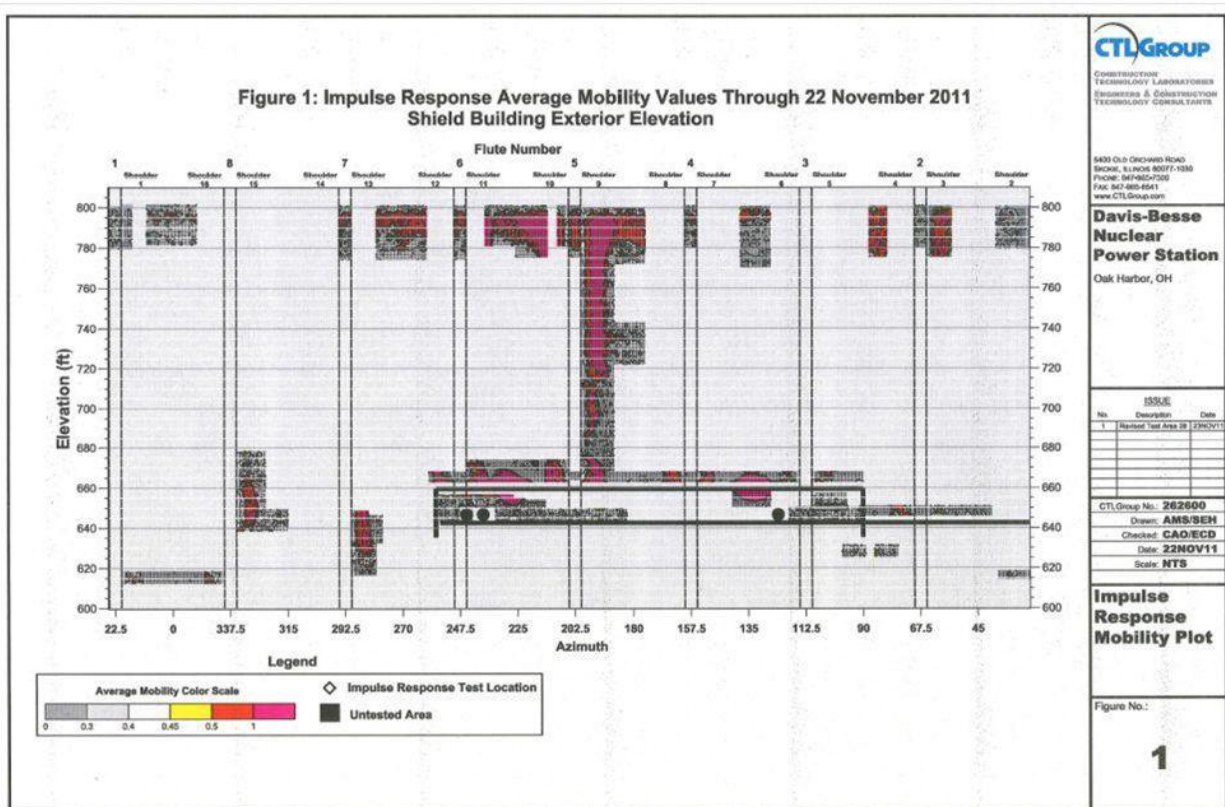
Davis-Besse Shield Building Laminar Subsurface Cracking
